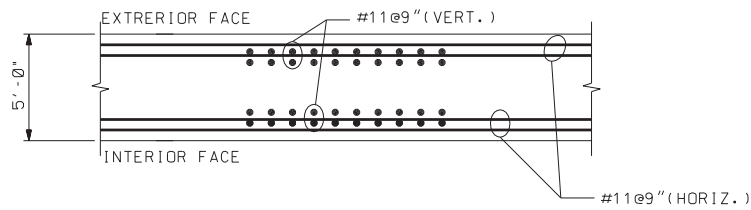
A-40 Reinforcement Arrangement of the AB MSIV House Wall (Section 1)
